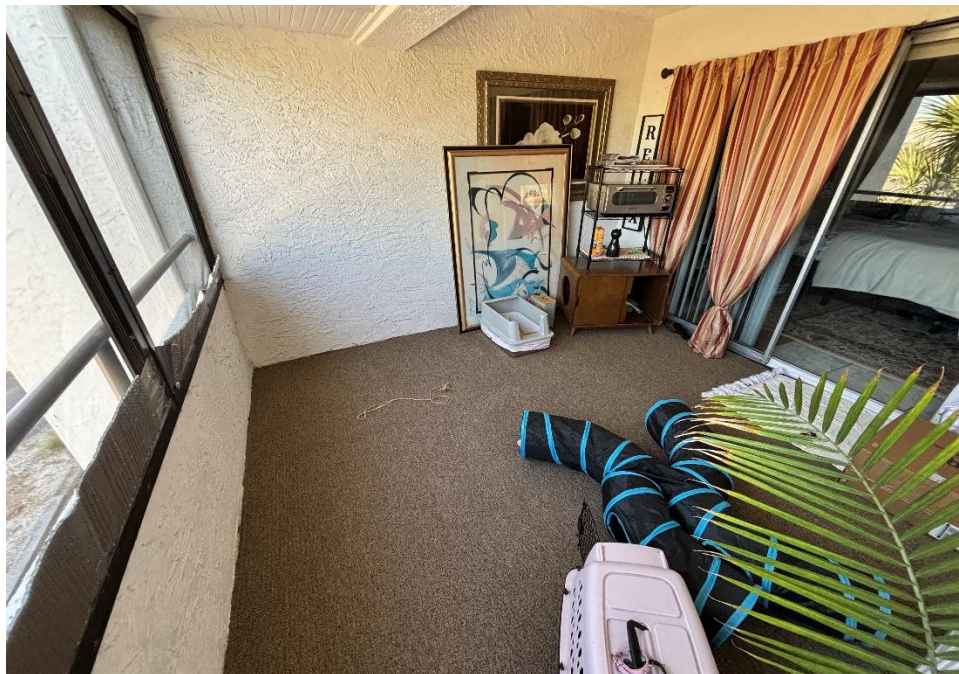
Typical balcony condition showing no visible signs of structural distress – Building 2.
